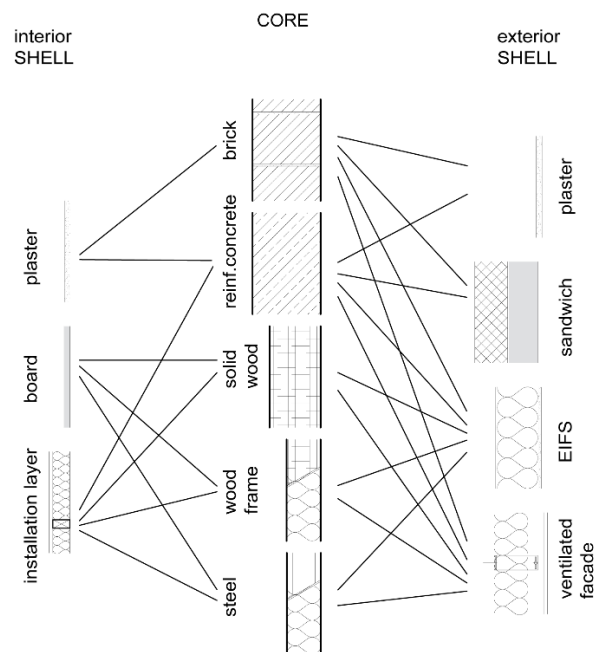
Possible component structures of cost group 330 Exterior walls/vertical building structures exterior.
